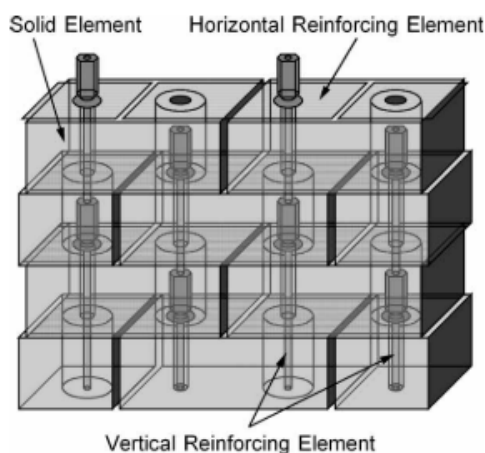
Prestressed reinforced brick wall (Yamaguchi et al., 2007)
